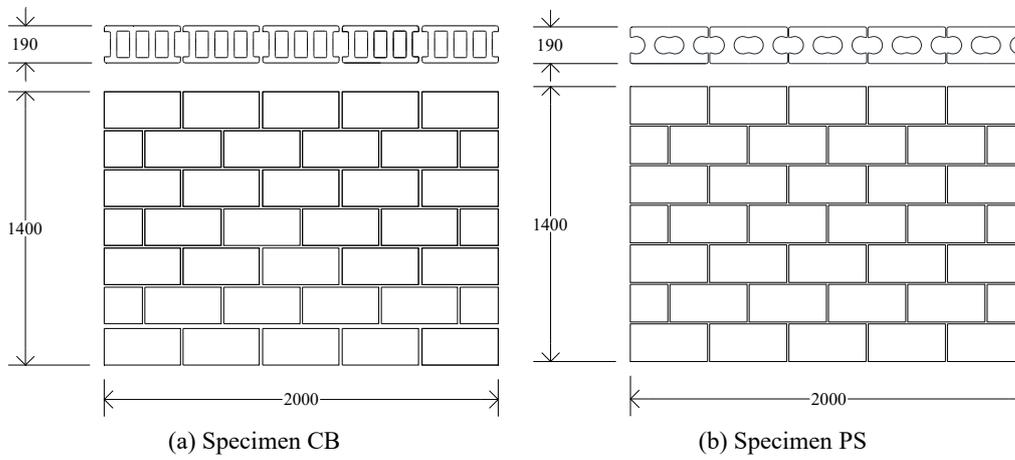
Details of typical and proposed concrete block wall specimens (unit: mm).
